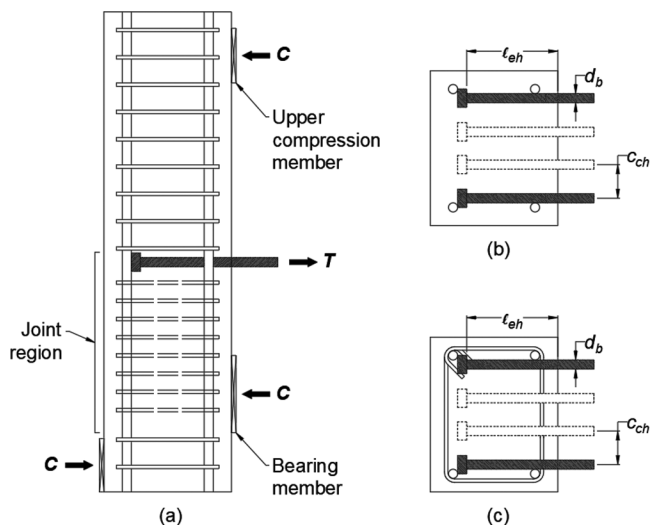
Beam-column joint specimens: (a) side view with loading configuration; (b) cross section of specimen at joint region without confining reinforcement; and (c) cross section of specimen at joint region with confining reinforcement parallel to headed bar.
